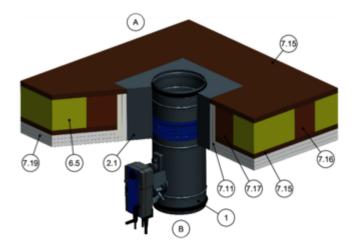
Mortar-based installation into wooden beam or gluelam ceiling, upright (illustration is an example; other ceiling constructions upon request)
